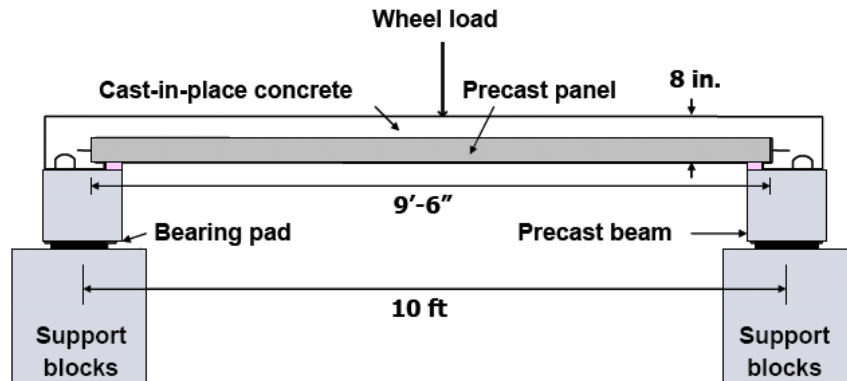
Elevation View of Positive Moment Specimen Subject to Fatigue Loading (Agnew 2007)
